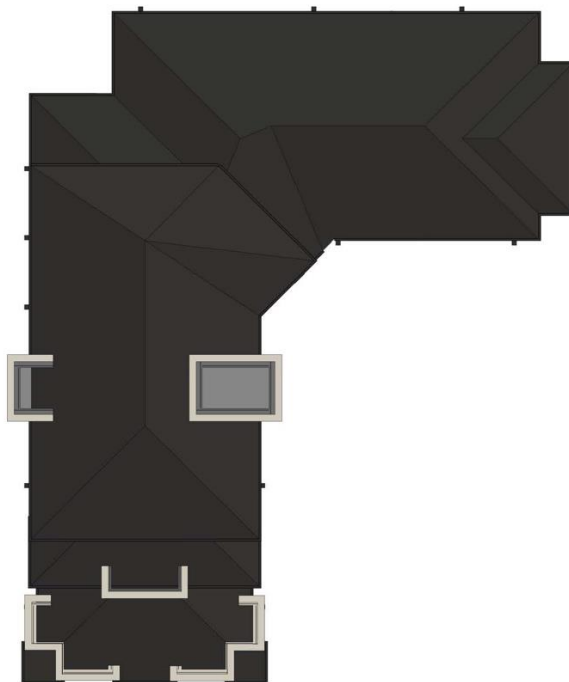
The roof plan of Building B02 (Ryman Drawing A1-020 RC18).
